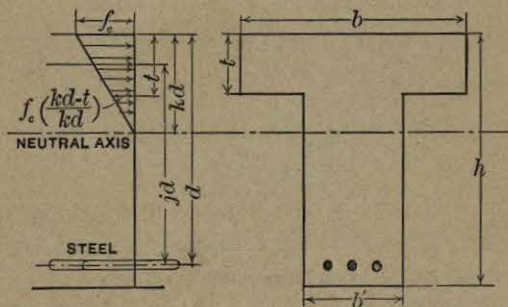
Resisting Forces in T-shaped Section of Beam. (See p. 755.)
